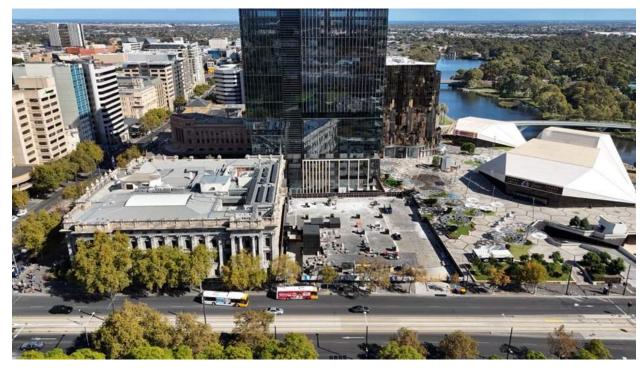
Aerial image of existing site context. Parliament House, Adelaide Festival Centre and Festival
